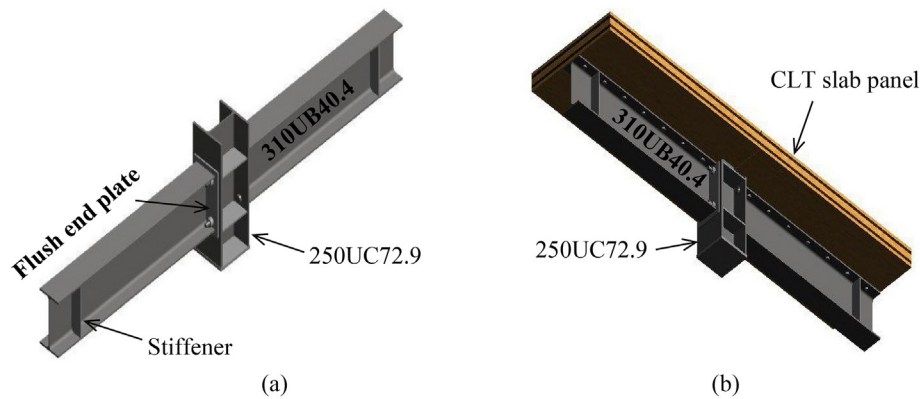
Outline of specimens, (a) before and (b) after connecting CLT slab panels to top flange of beam.
